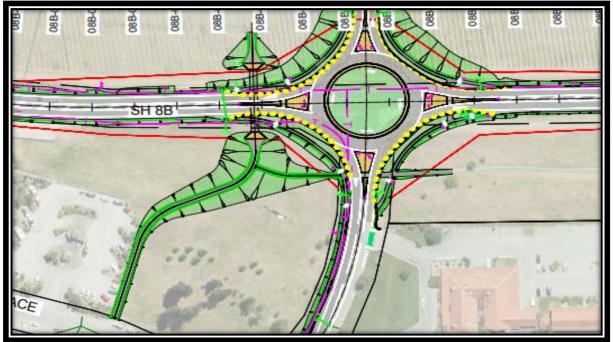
Plan of the New Roundabout, Footpaths, and Underpass.
